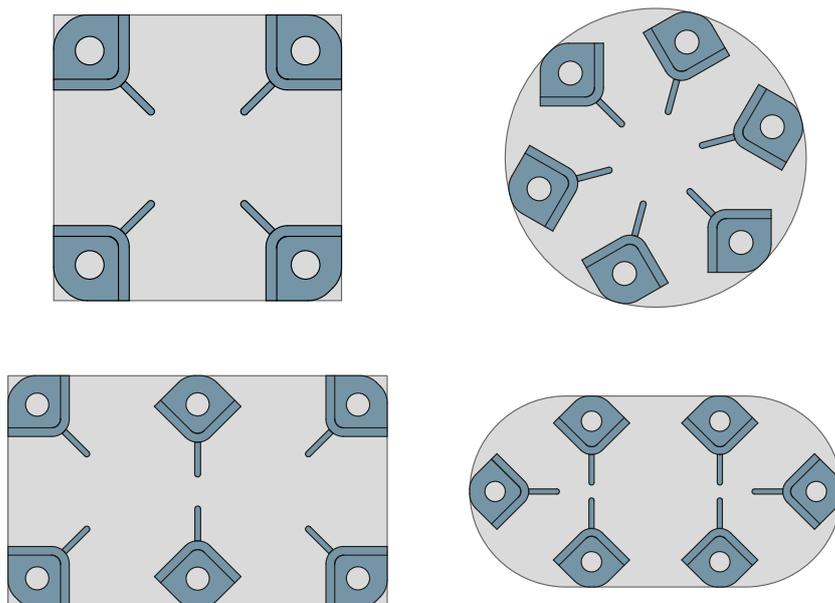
HPKM Column Shoes and HPM anchor bolts in column connection.
